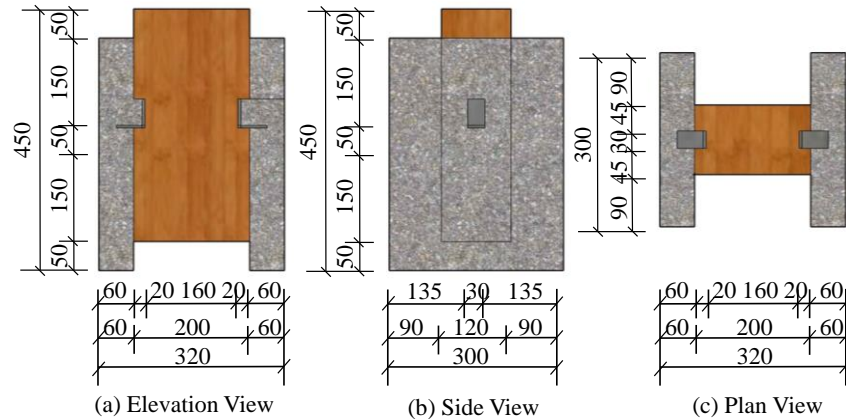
Dimensions of the timber–concrete composite reversed cyclic specimens (in mm)
